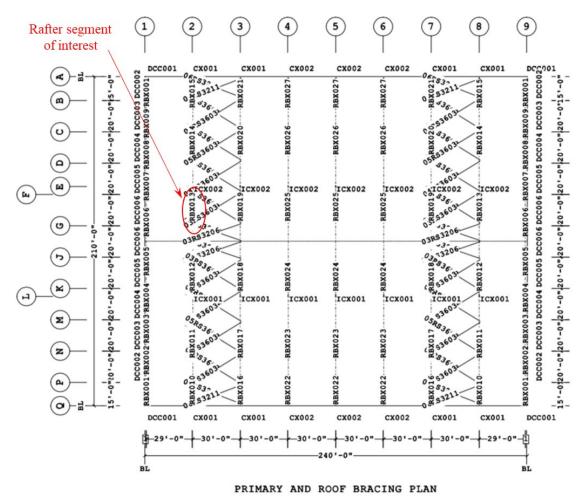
Plan view of roof framing detail of prototype metal building [from NBM (2018)]
